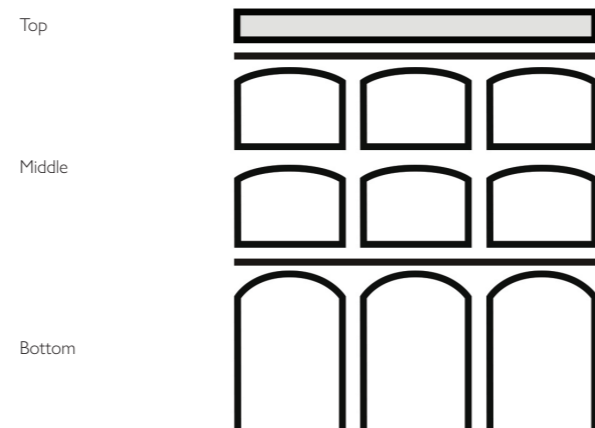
Building façade detail on Electric Avenue
